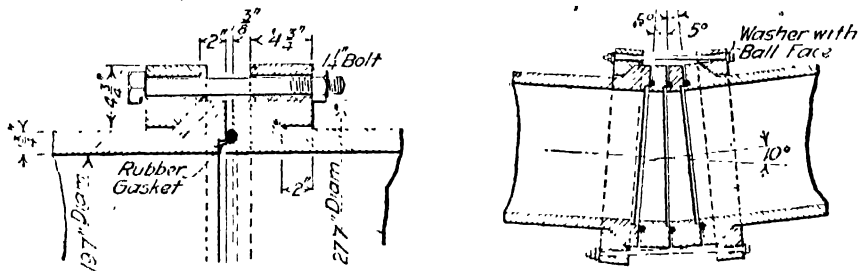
Pipe joints used on Lac Fully high-head plant
